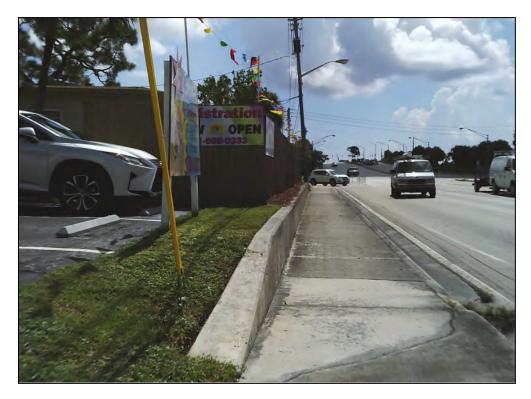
View of Archaeological APE Along Lantana Road to the East of High Ridge Road, facing East
